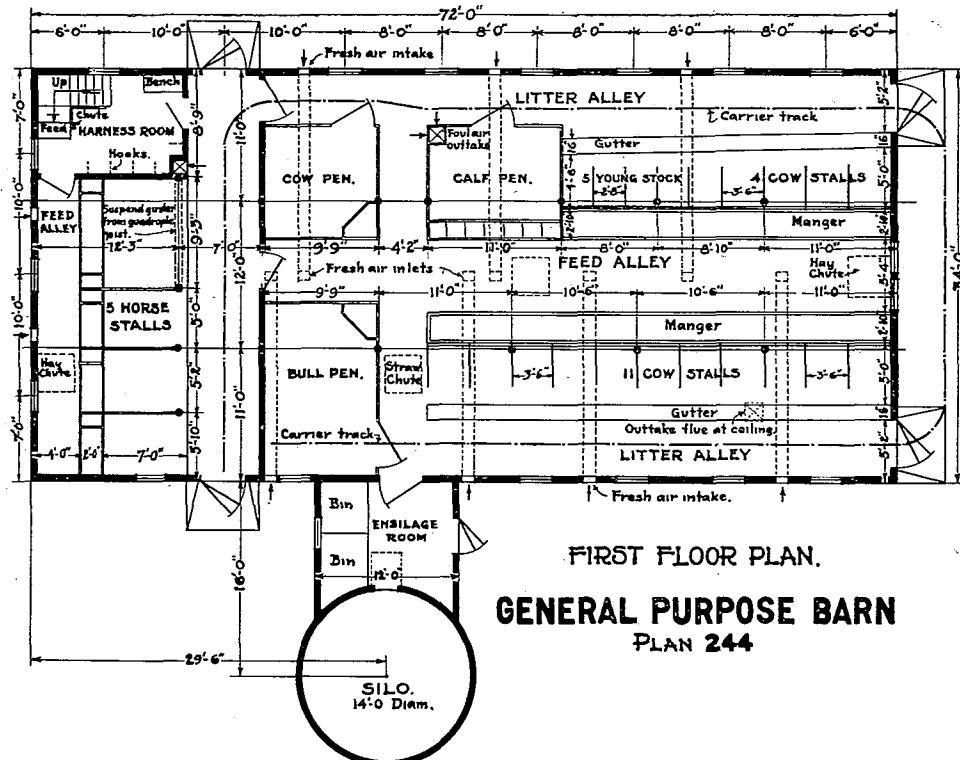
General Purpose Barn, 34x72 Feet, Plan 244
